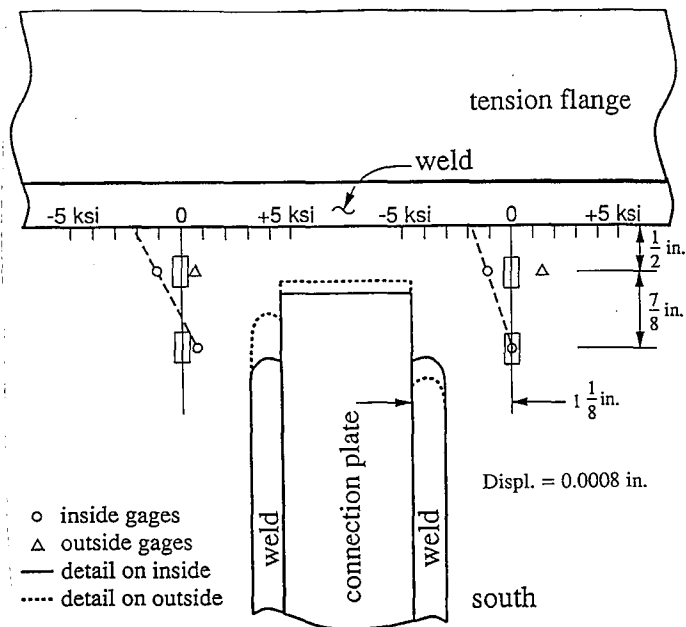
Static Stress Distribution on Inside Girder at Pier S7-5 (84 in. Girder) After Retrofit with Dump Truck in Outside Lane (Worst Case)
